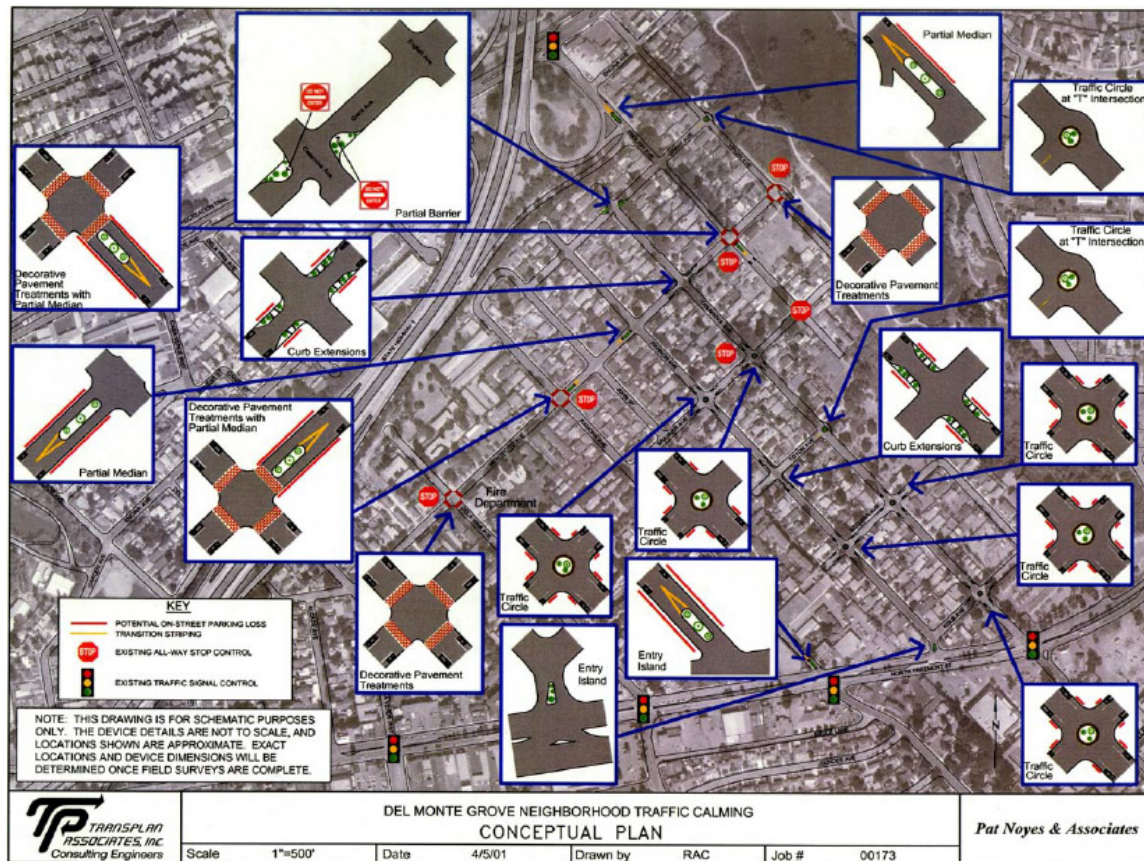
Traffic Calming Plan Recommendations for 2001 Plan
